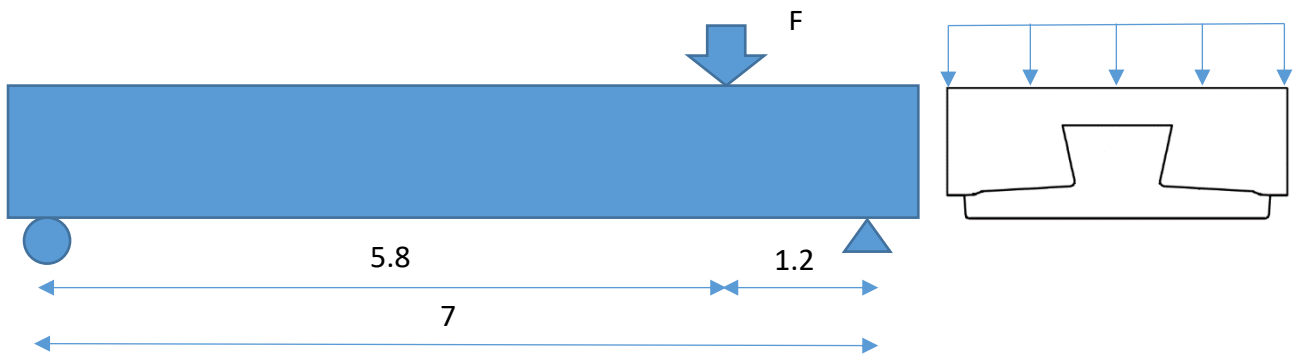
Simple schematic of the 3-point bending test (shear test) performed on specimen 4, units in meters
